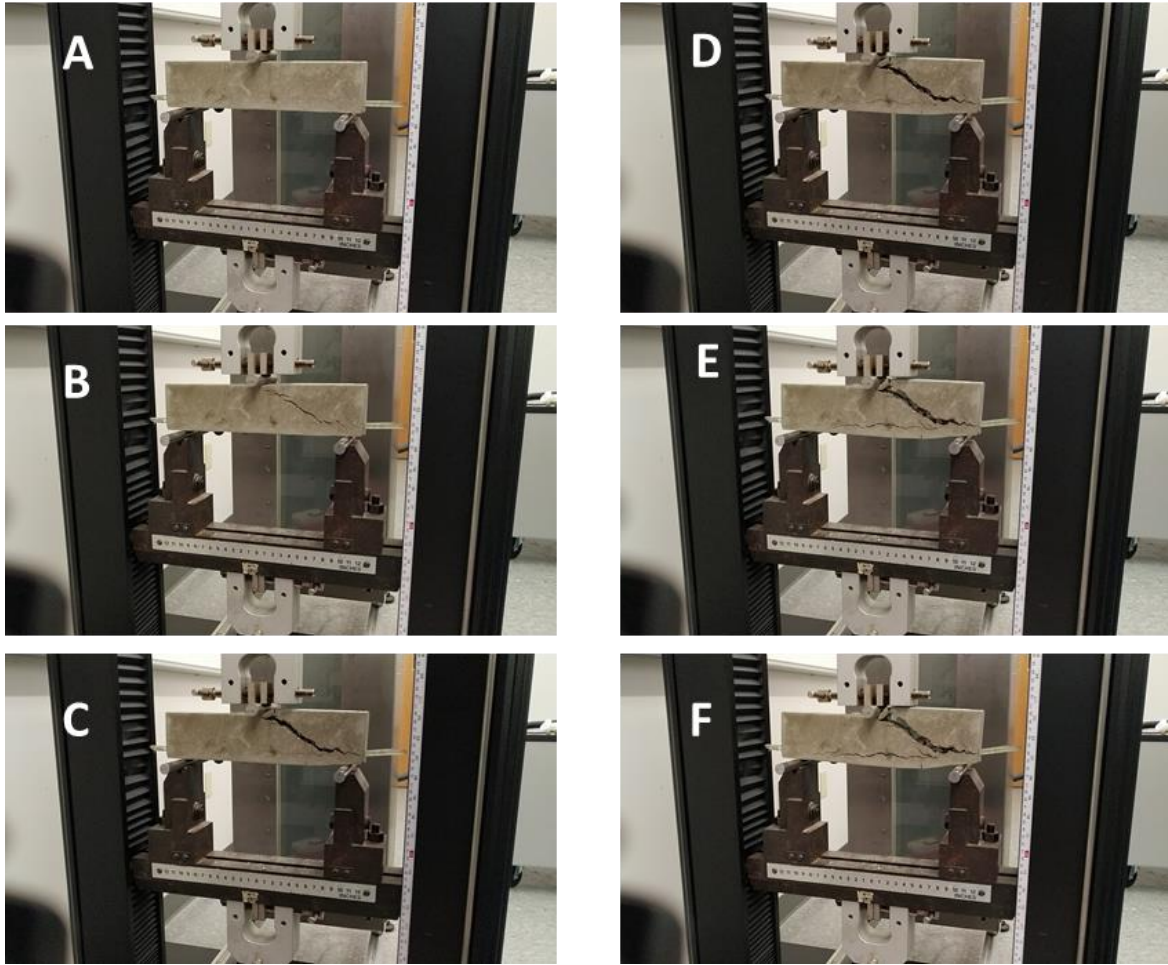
The crack process of the concrete beam with the E-glass FRP rebar which the volume fraction of the glass fiber is 50%.
